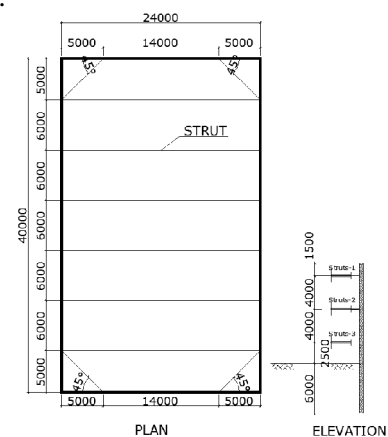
Layout plan and section of the excavation and strutting system (By the researcher)
